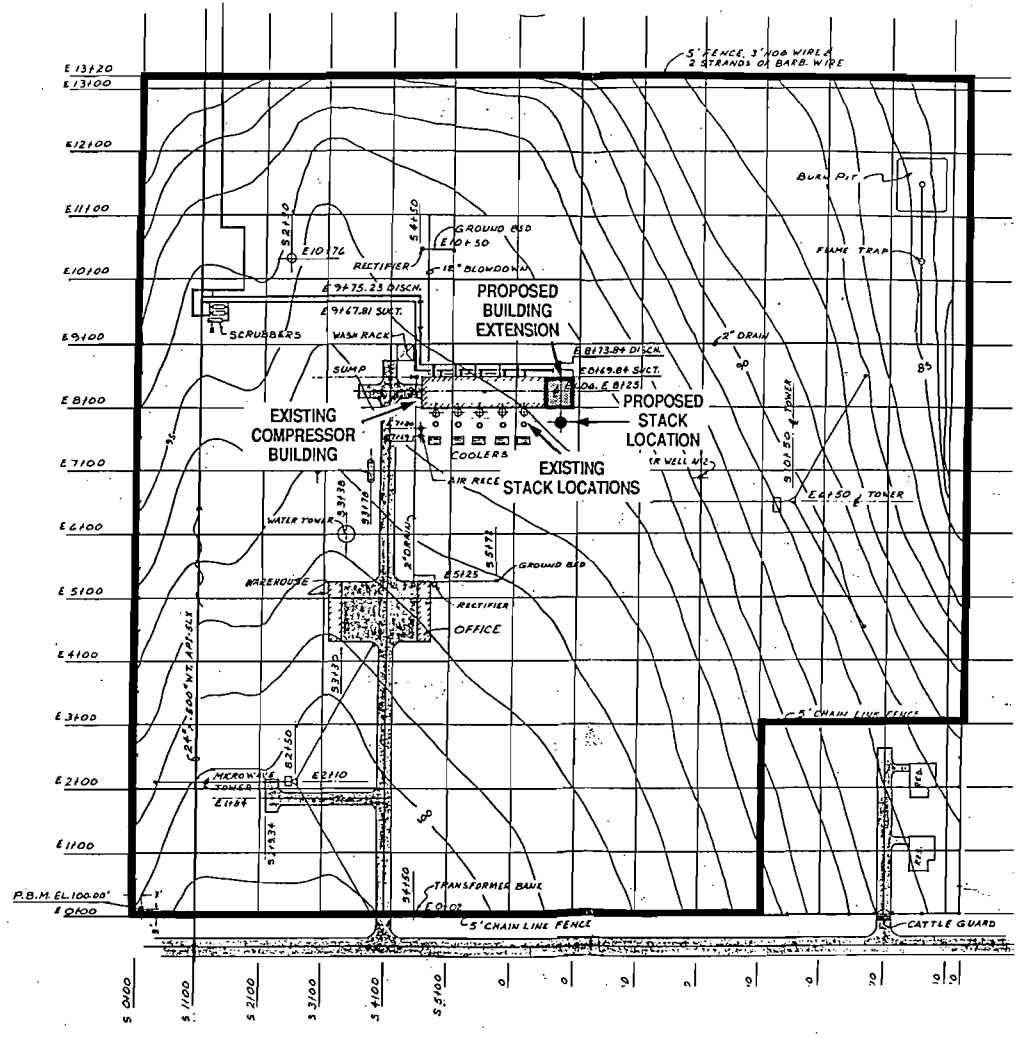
PLOT PLAN OF COMPRESSOR STATION NO. 14
